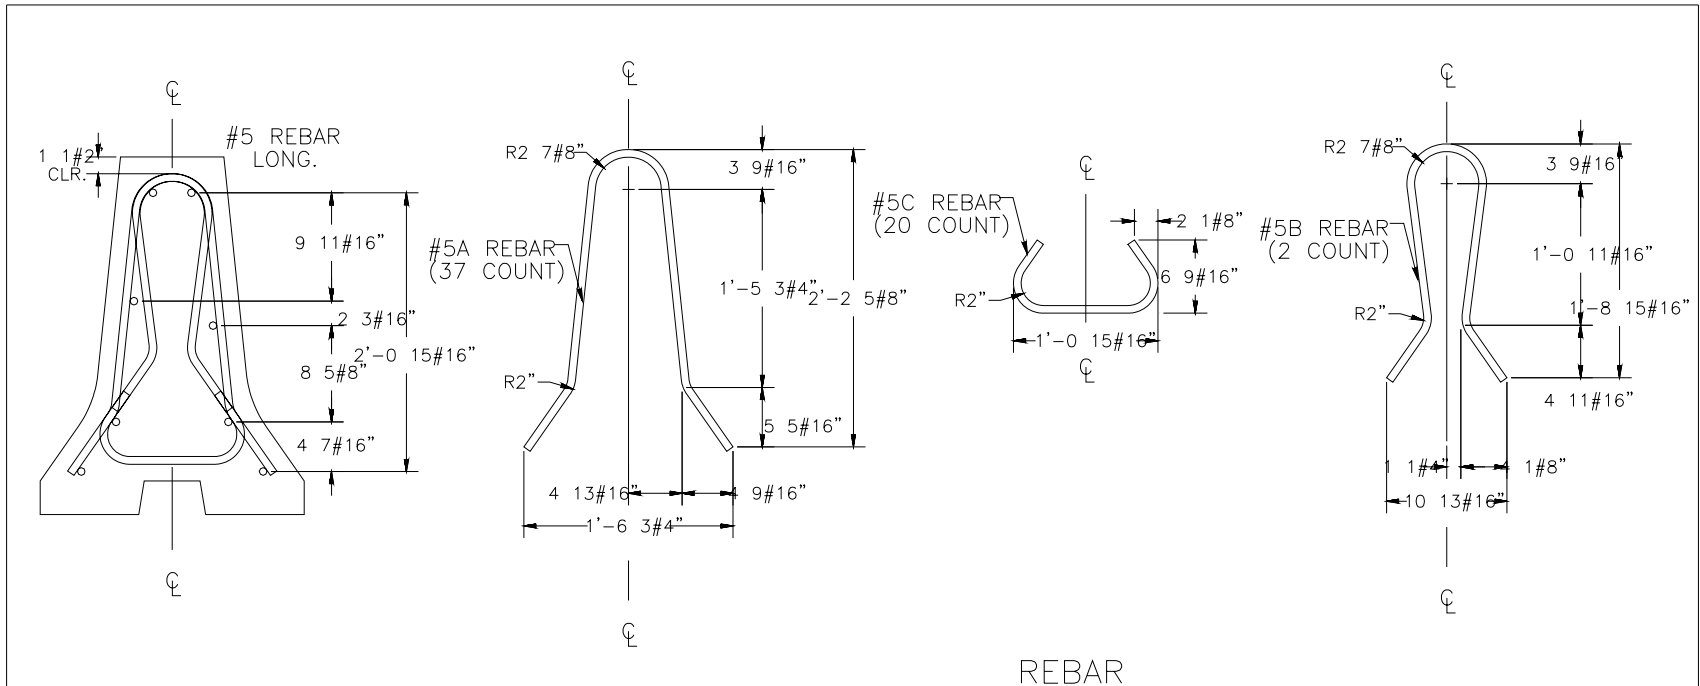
Layout of the Cross-Bolt, F-Shape Precast Concrete Traffic Barrier.
